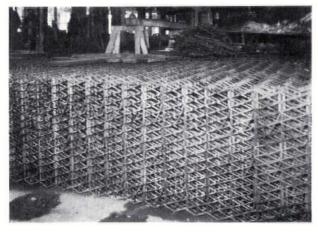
Vault Floor Reinforcing on Edge, Spaced by Vertical Bars
